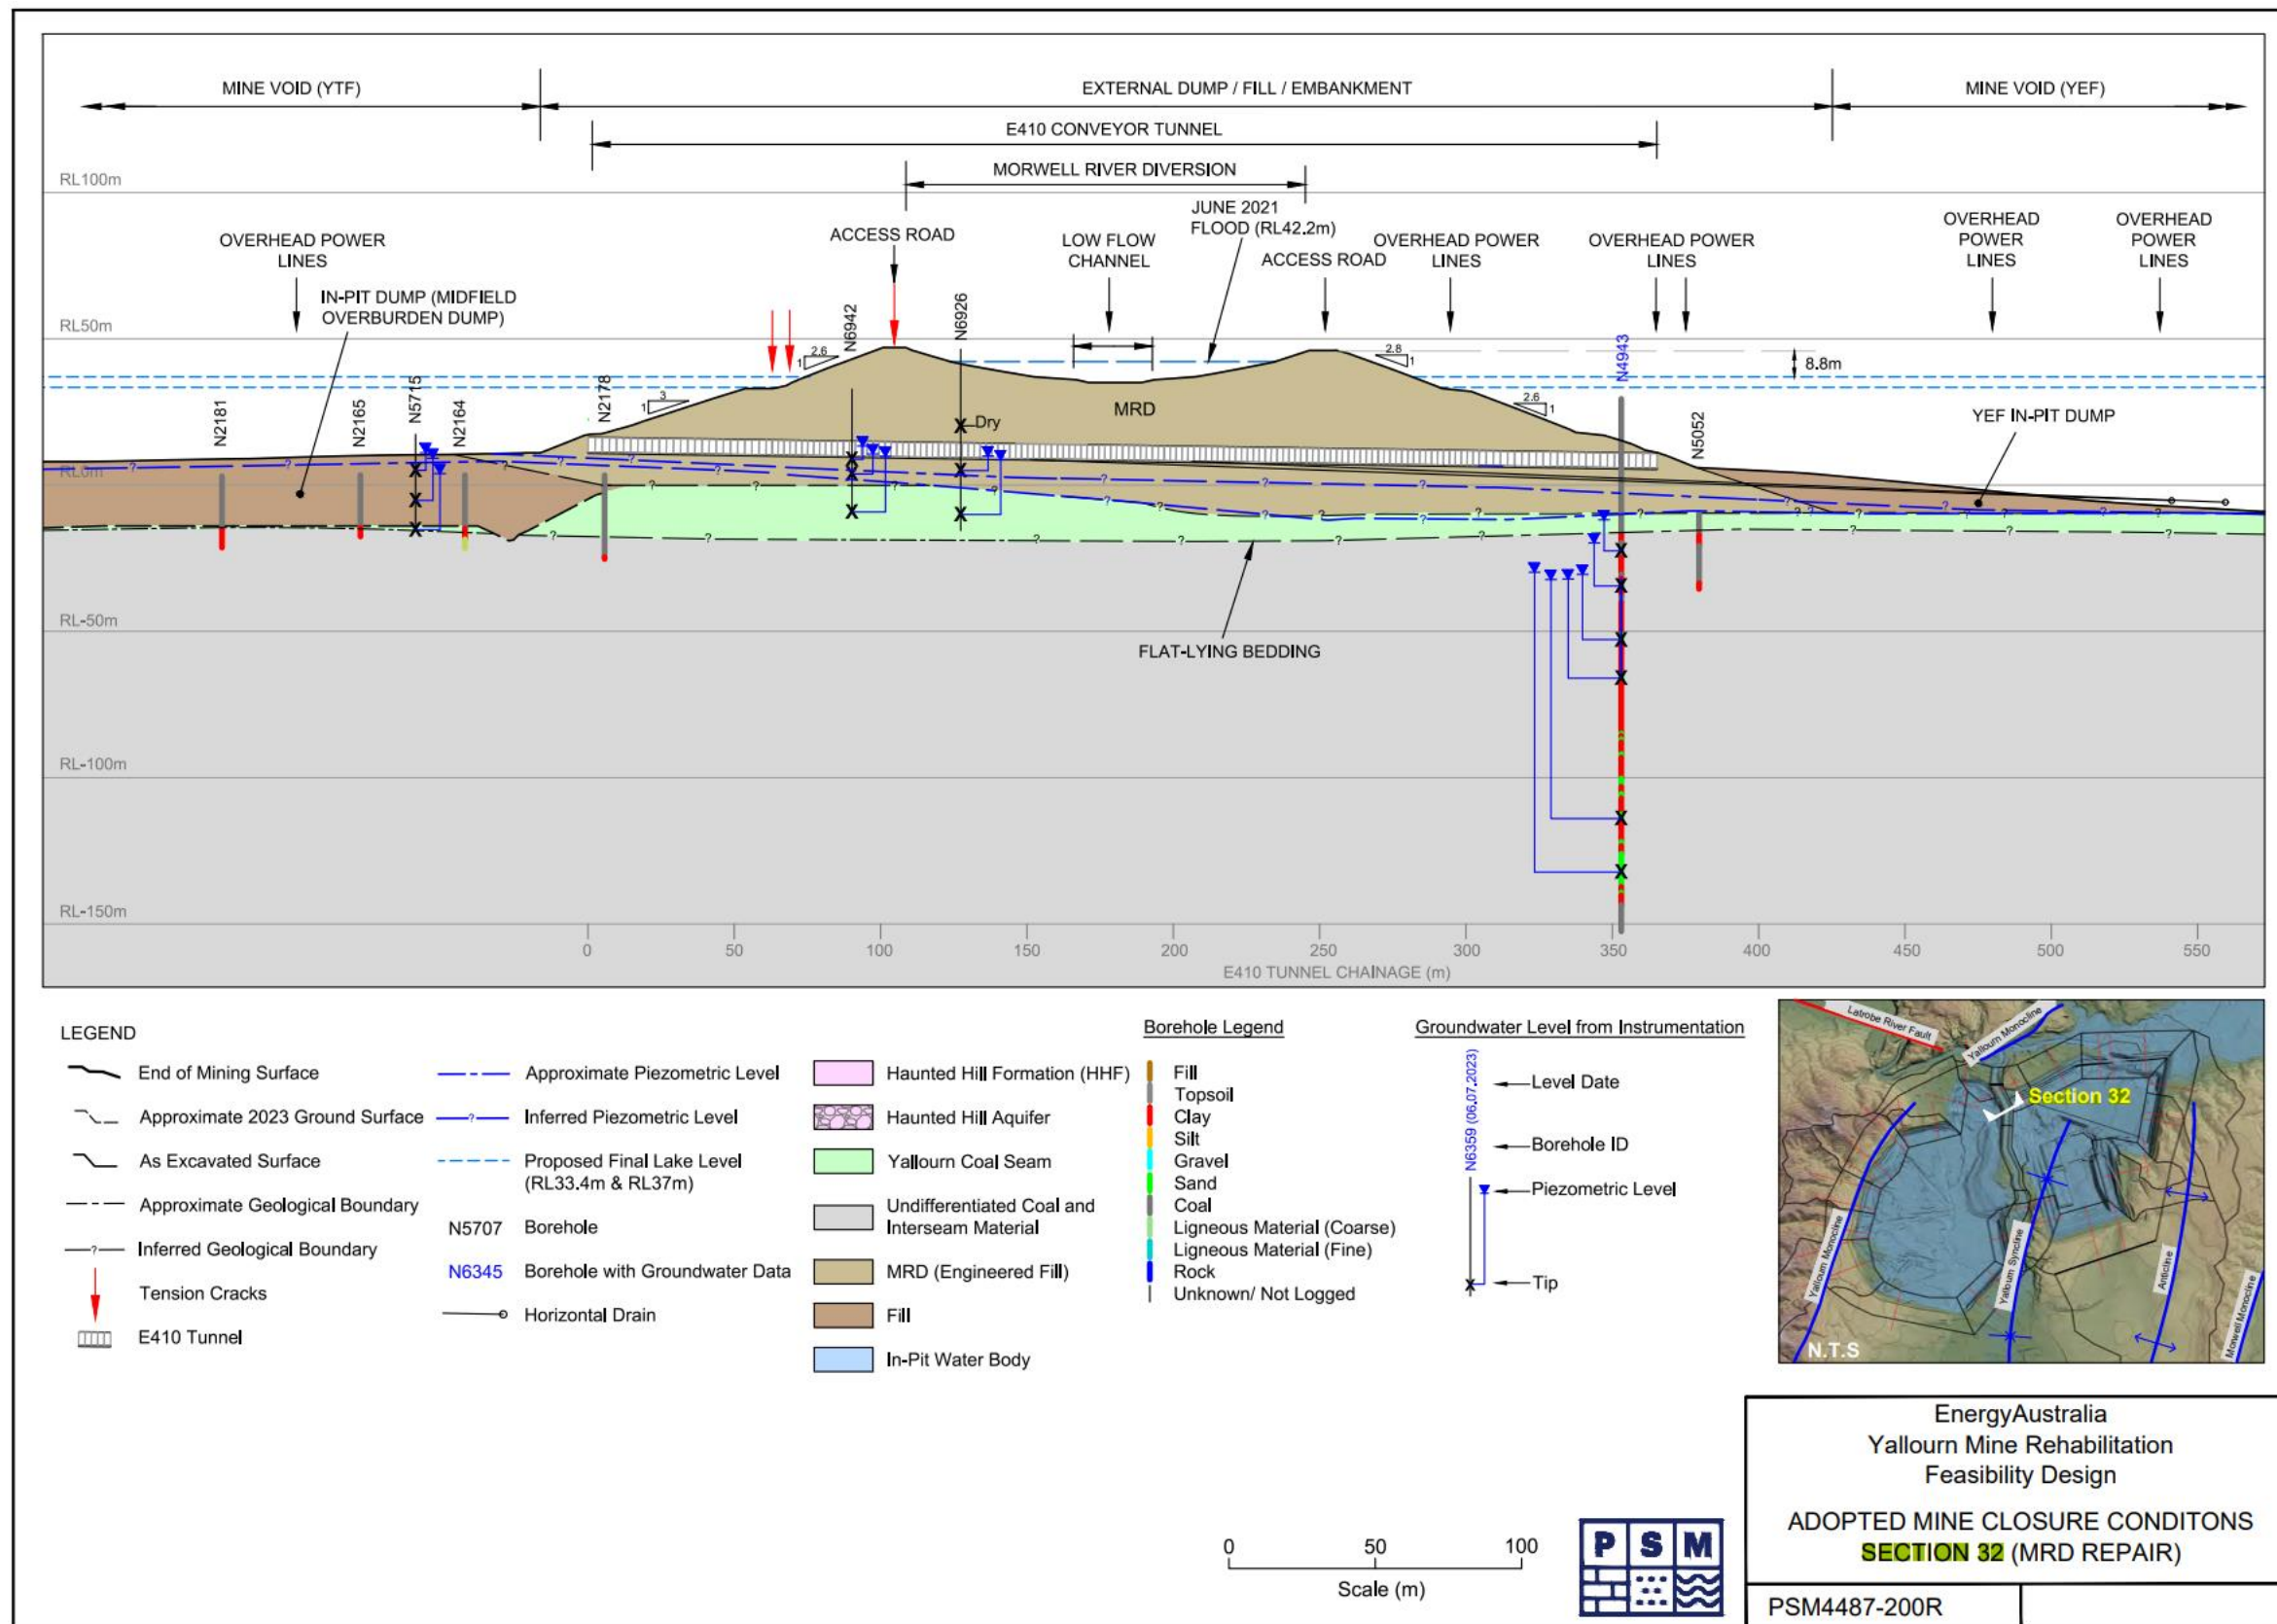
MRD Geotechnical Cross-Section (Section 32) (PSM 2025b)
